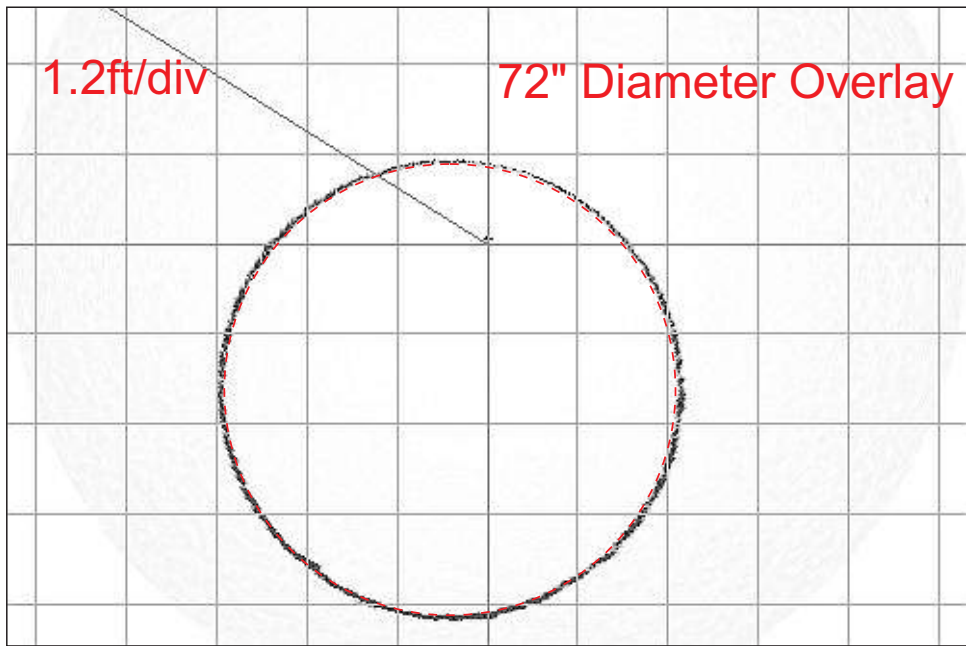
Sonar Profile 6 - 535 feet downstream of Access Point 1.
